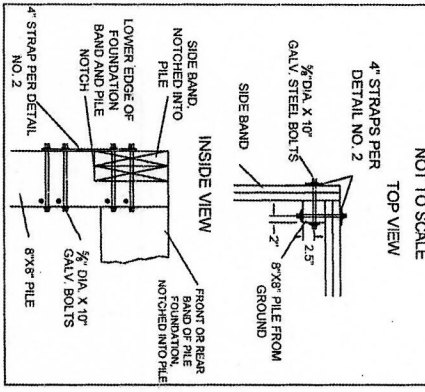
TYPICAL BUTT JOINT CONNECTION
